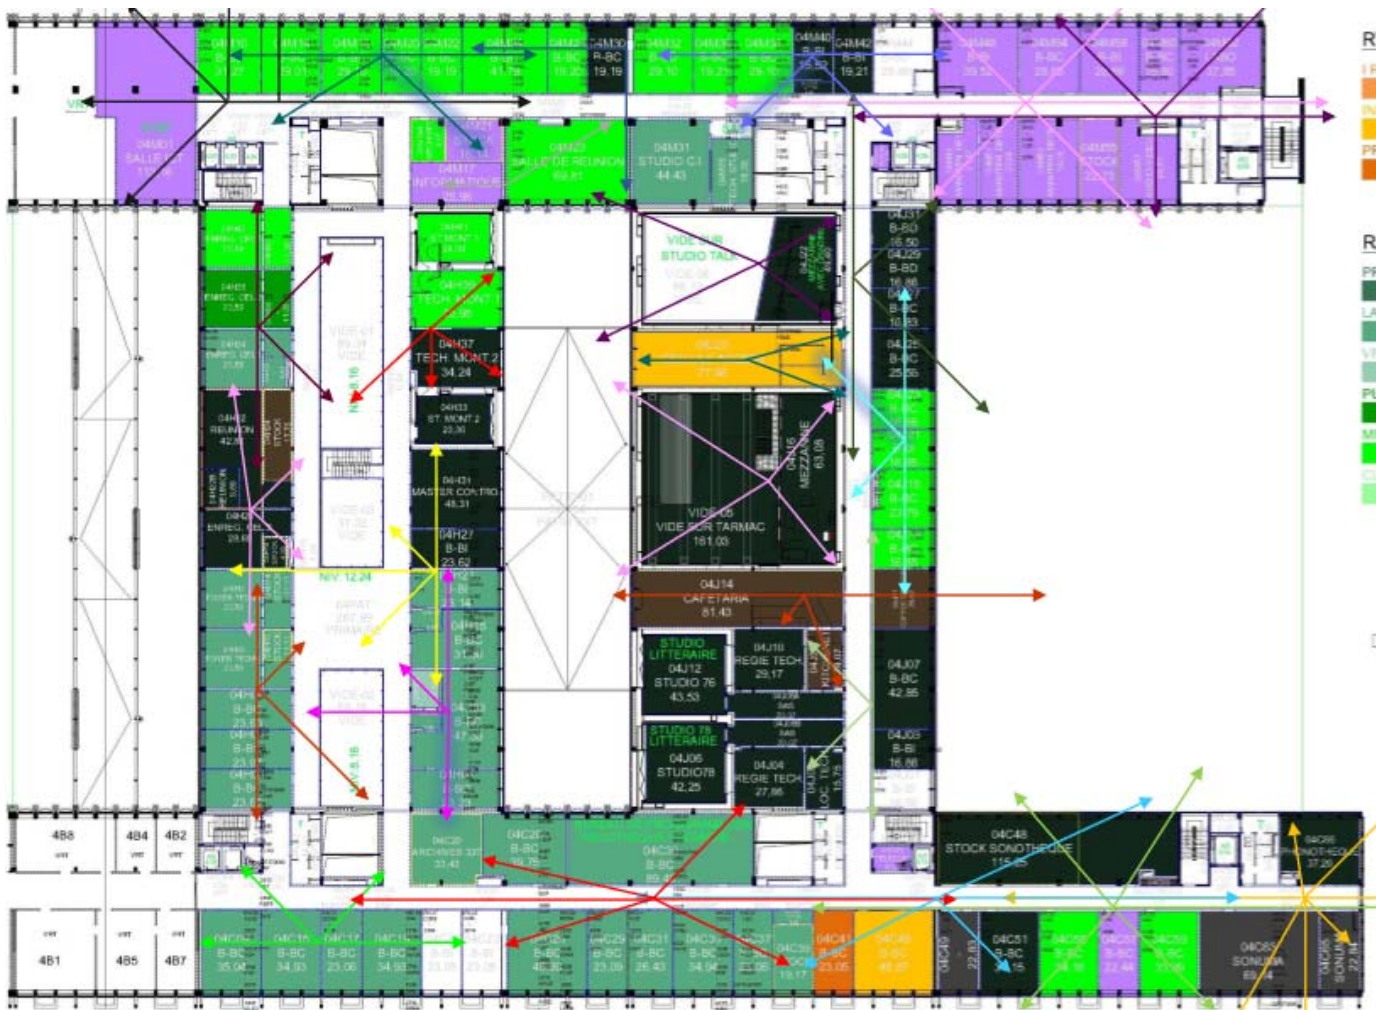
Design at 2.4 GHz for Floor 4 in Building PUVQ
